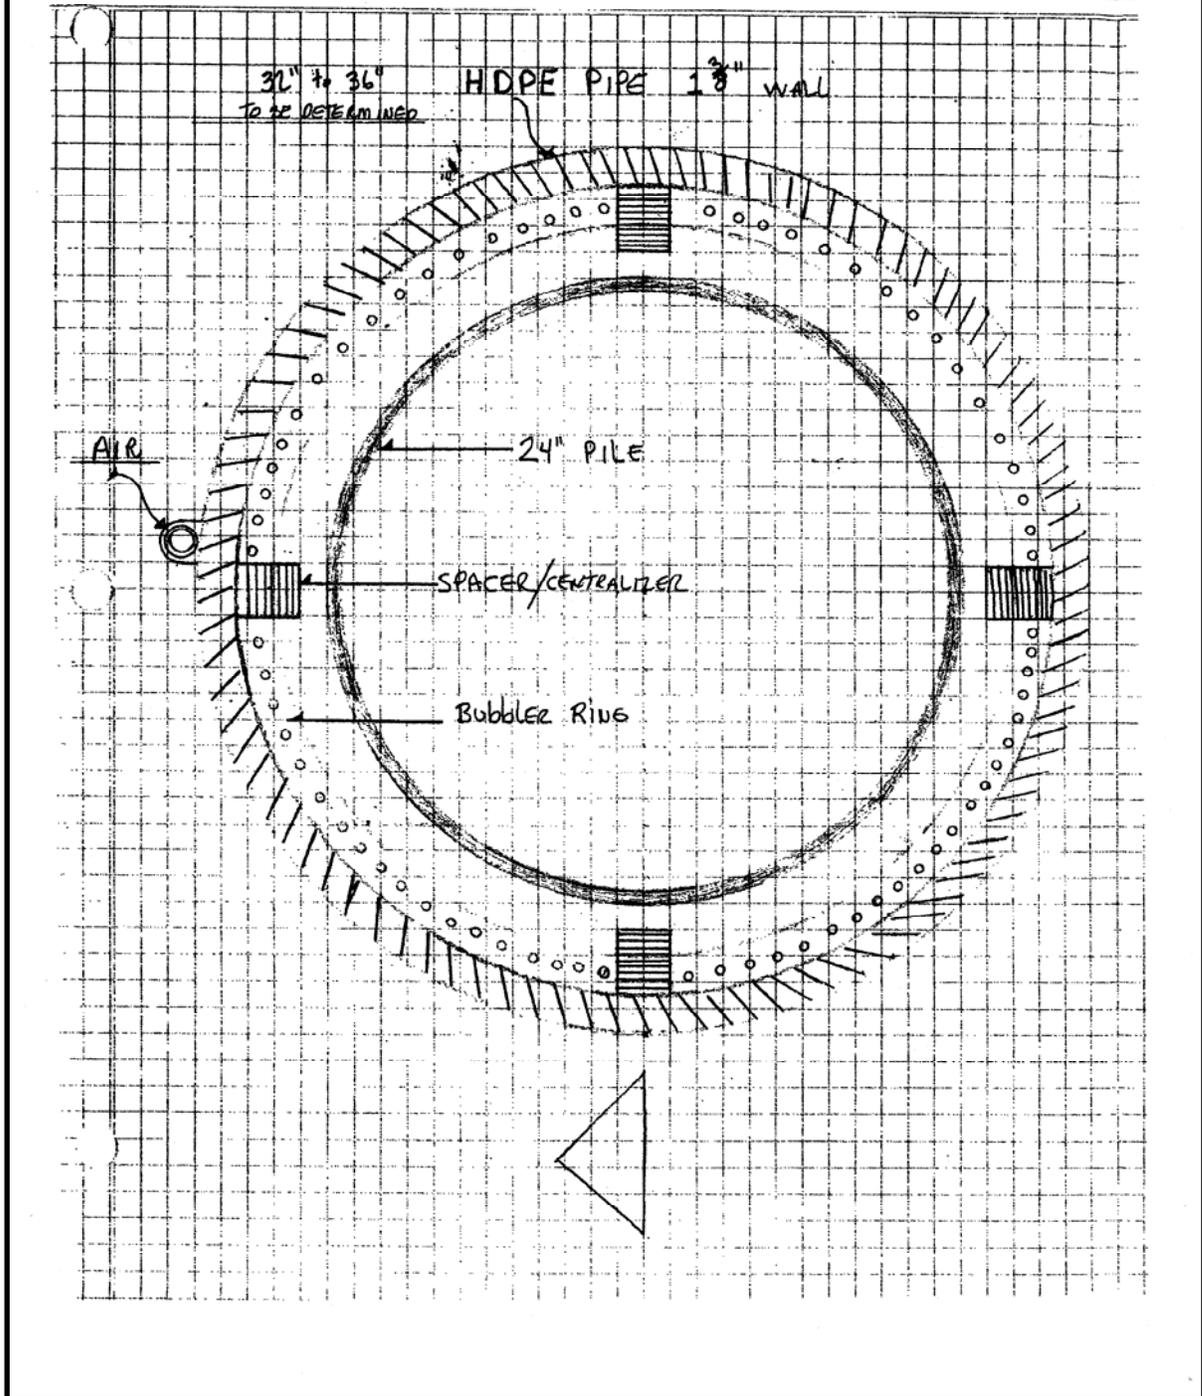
Contractor's Plan View Drawing of Bubble Ring for Confined Bubble Curtain used on Plumb Piles
